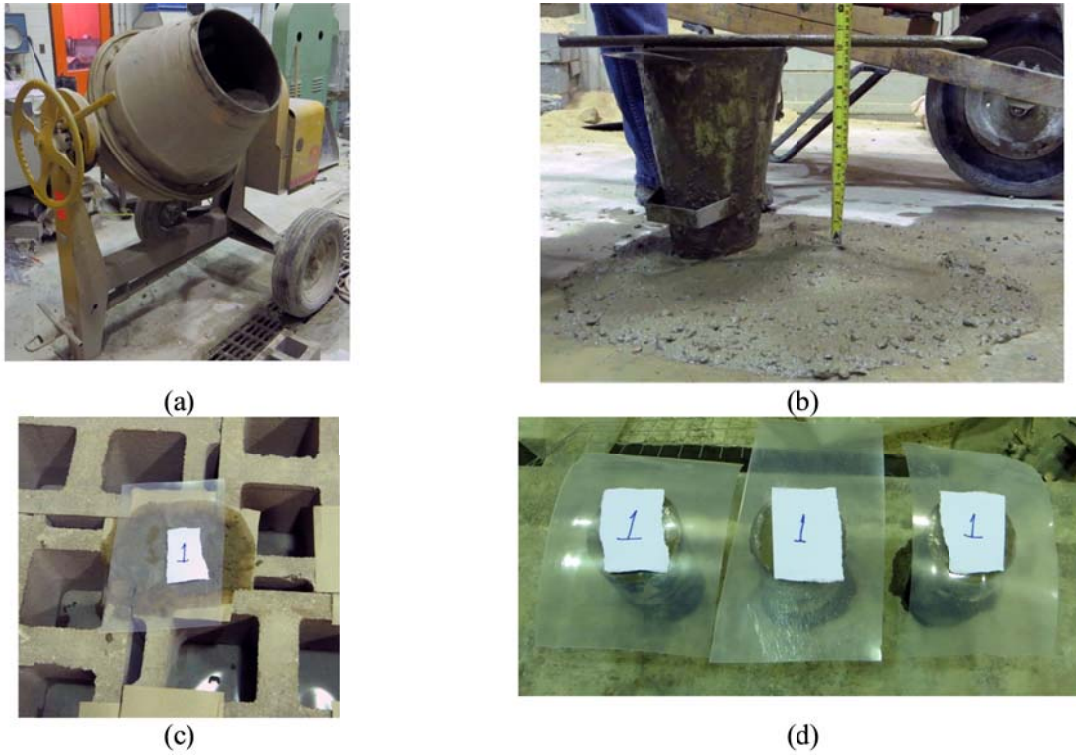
Grout Preparation: (a) Mixing Grout with Mechanical Mixer, (b) Slump Test, (c) Cast Absorbent Grout Prism in Previously Prepared Mould, and (d) Cast Non-Absorbent Grout Cylinders.
